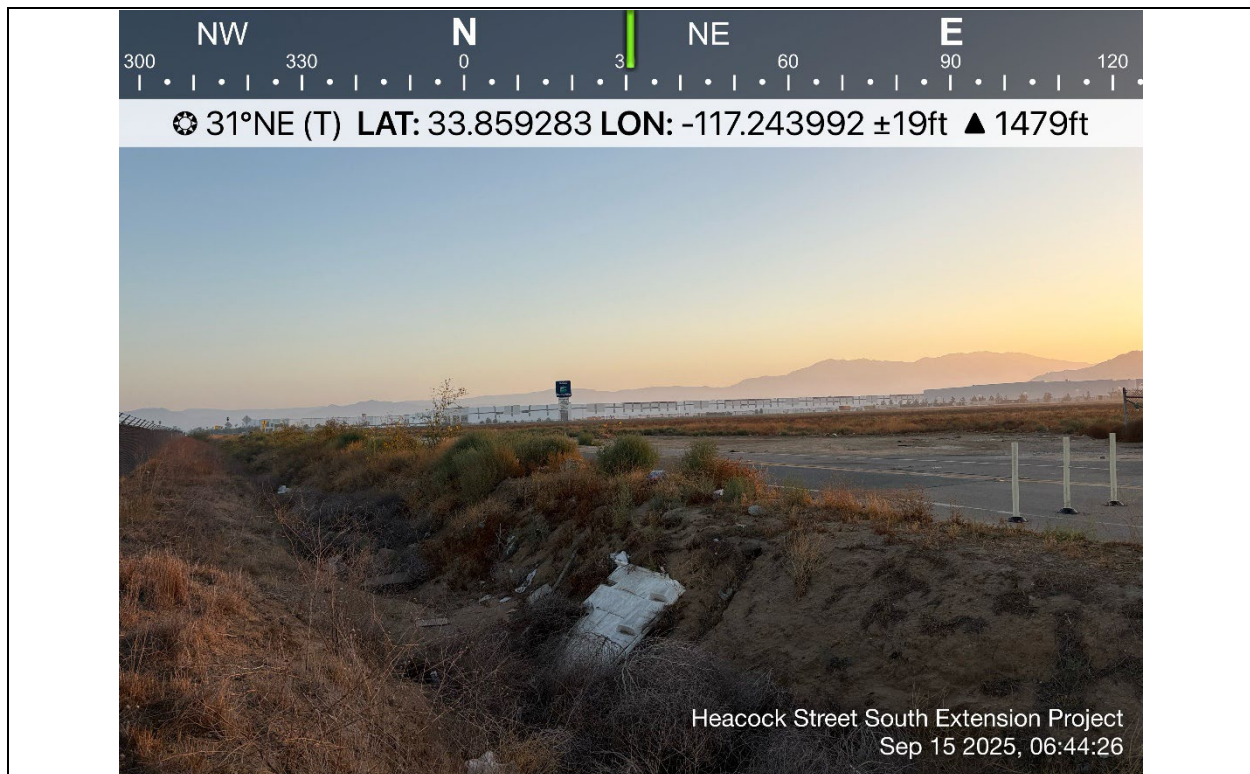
Site overview. View of the site from southwestern portion of BSA, facing northeast. Pictured to the left is a drainage ditch that immediately flanks Heacock Street throughout the BSA.
